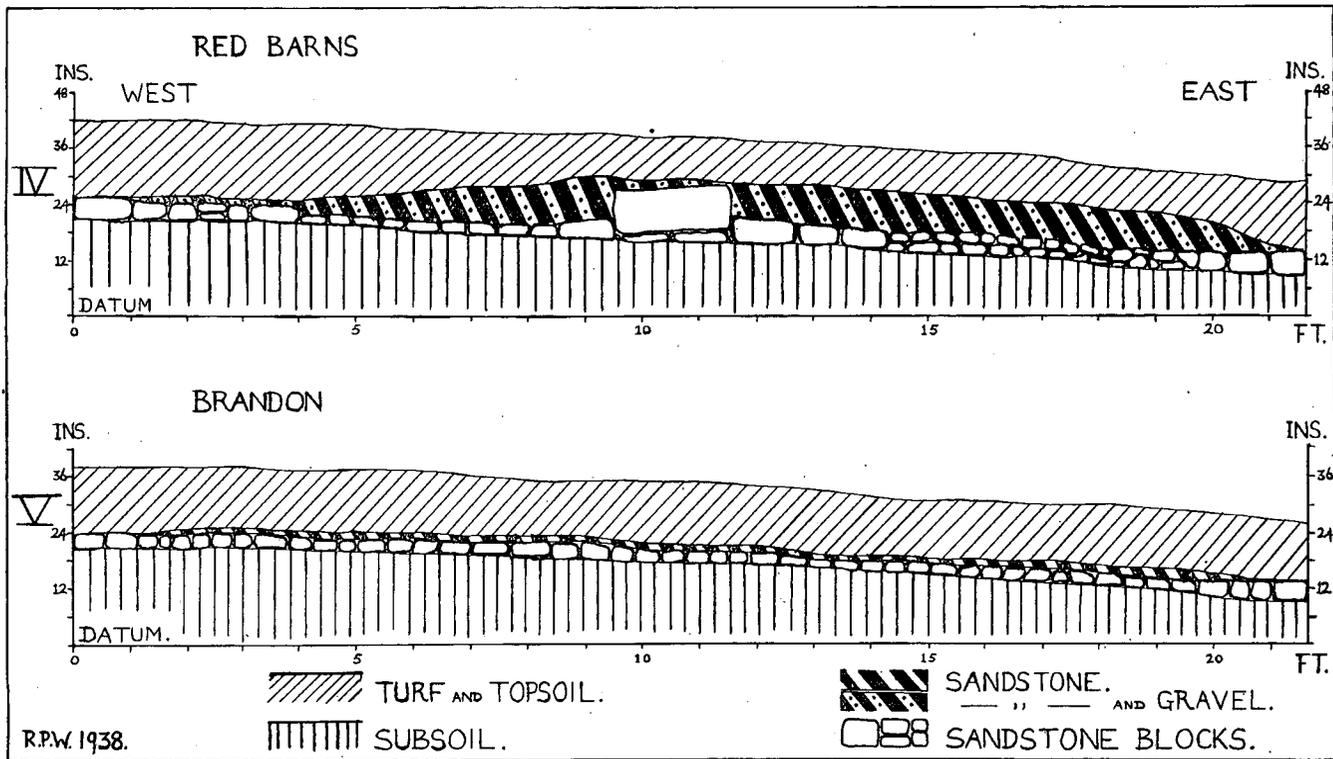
CROSS-SECTIONS OF ROMAN ROAD FROM WILLINGTON TO BRANDON.
